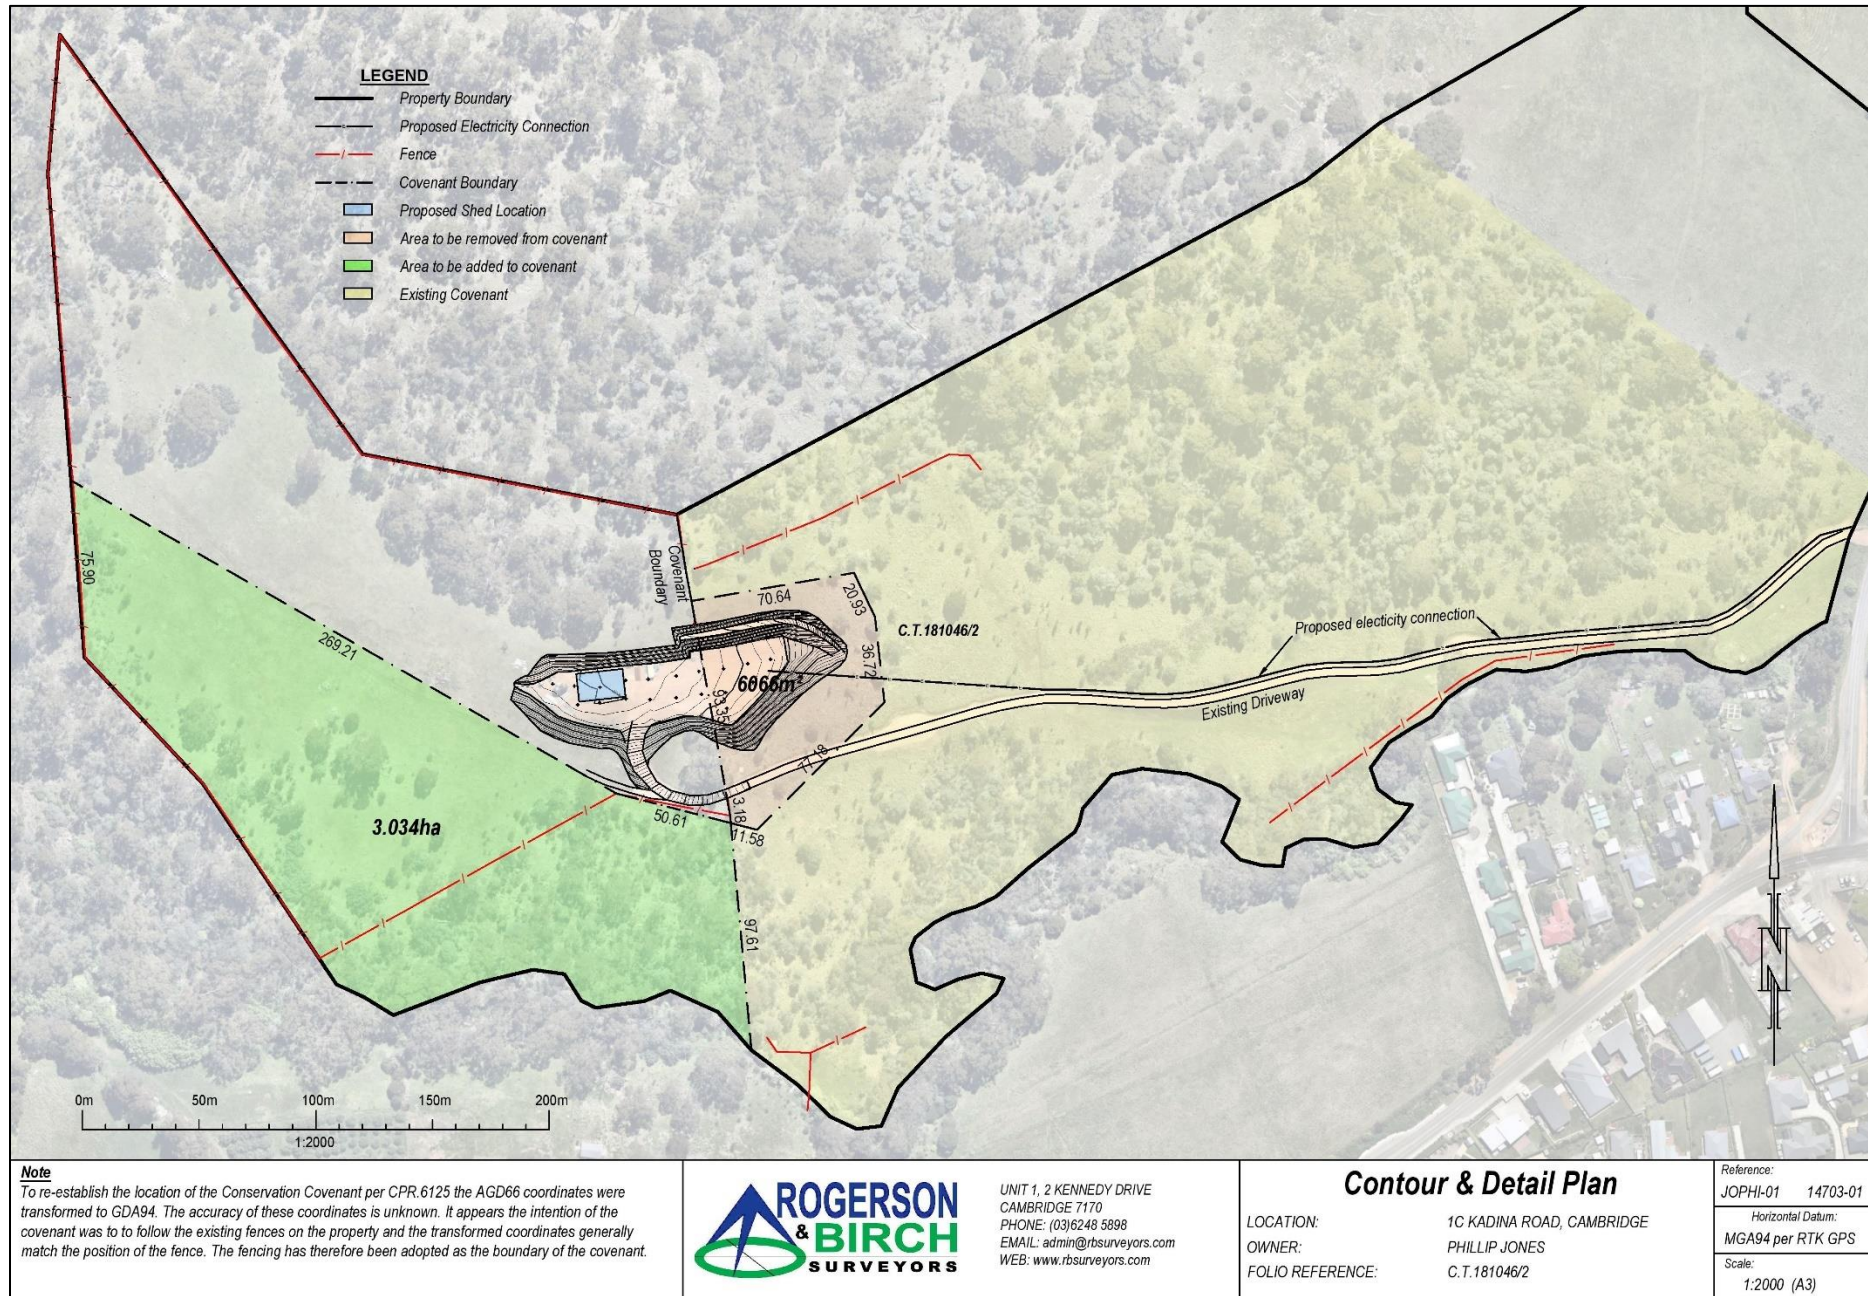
Site Survey Plan (Rogerson and Birch Surveyors, April 2023)
